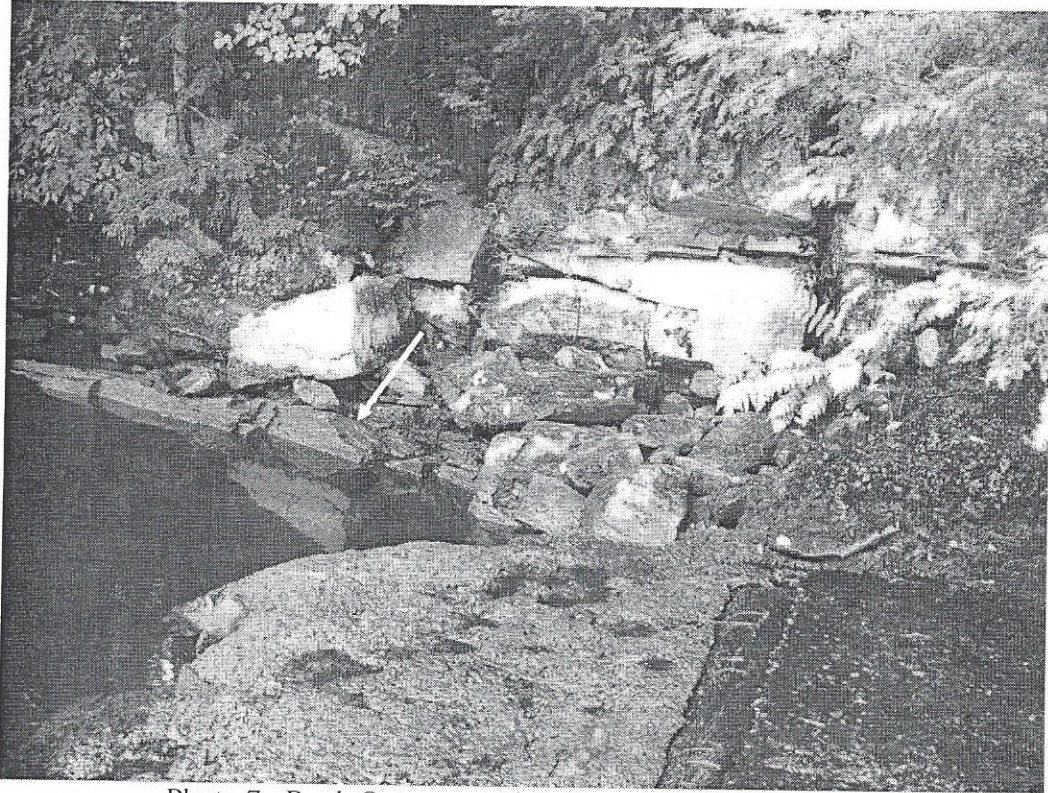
Rock Outcrop at Right Dam Abutment (Arrow).
